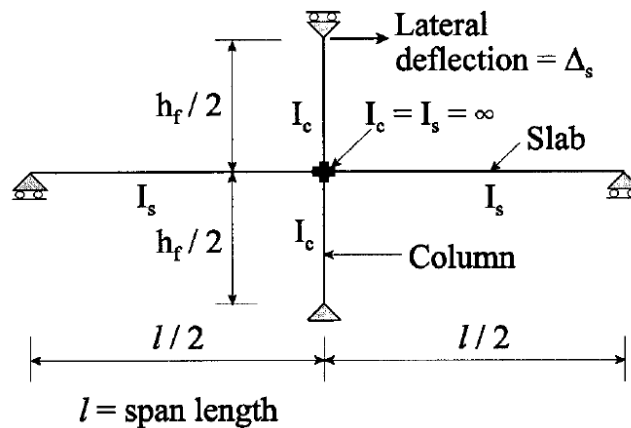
Plane frame idealization of slab-column connection, adapted from Megally and Ghali [27].
